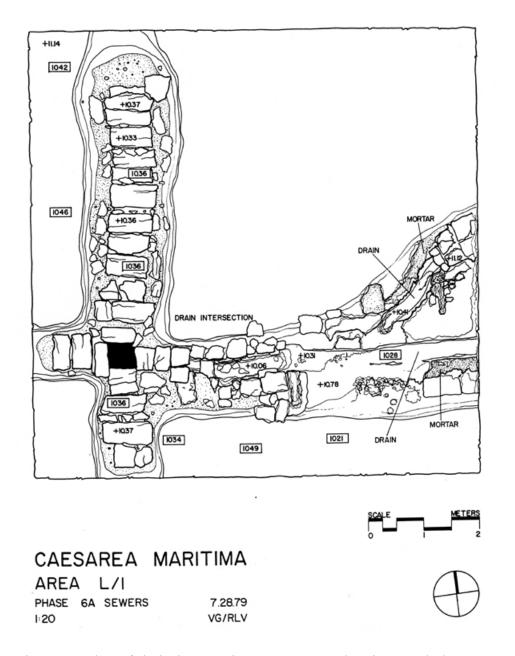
Plan of drain intersection at Caesarea showing manhole access point [Wiemken and Holum 1981, fig. 8].
